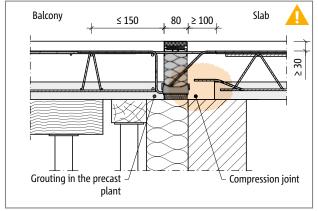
Schöck Isokorb® T type K: Fully-finished balcony with height offset floor on fully-finished reinforced concrete wall
